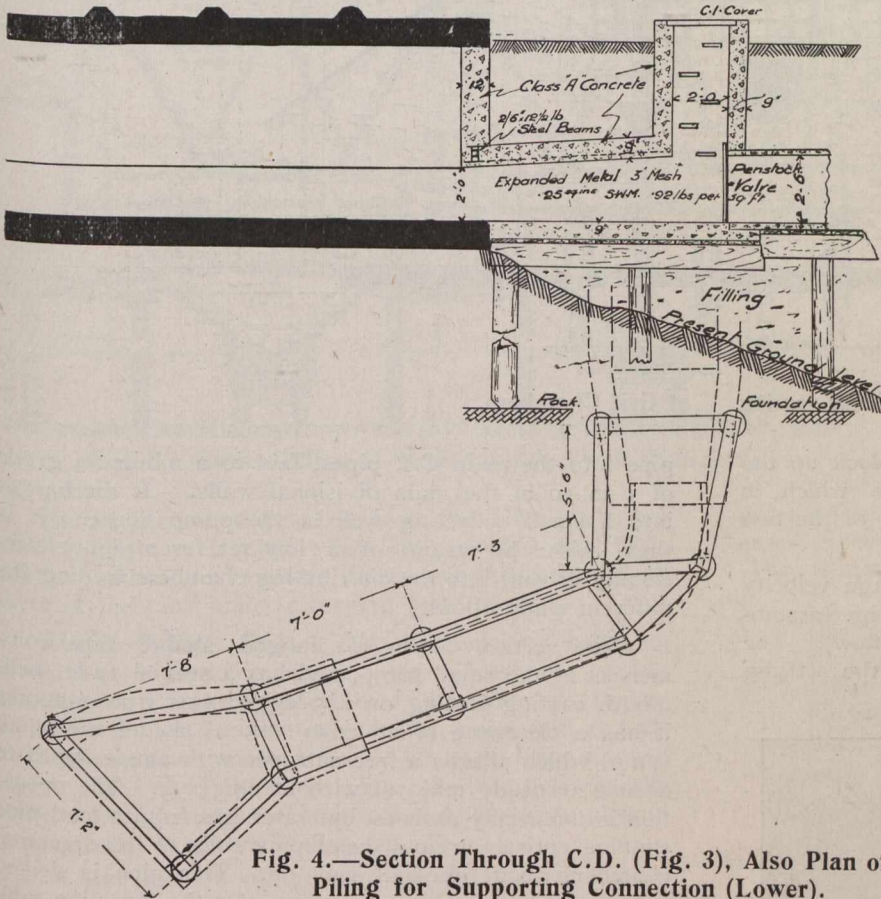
Section Through C.D. (Fig. 3), Also Plan of Piling for Supporting Connection (Lower).
